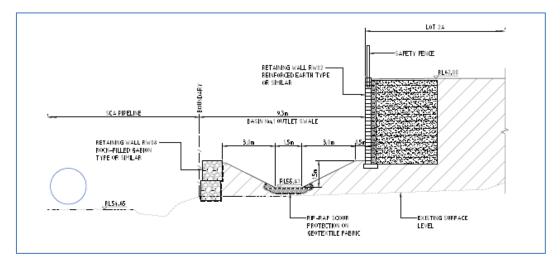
Typical Section through Retaining Wall – Northern Boundary
